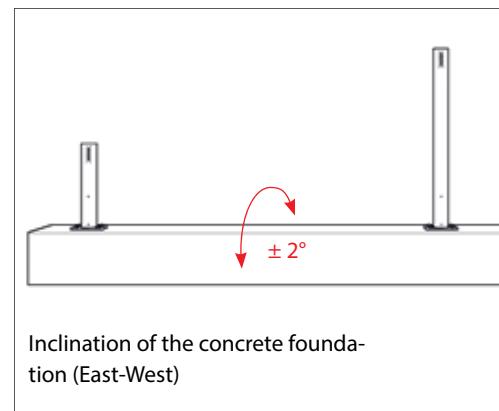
2 (east-west tilt of the concrete foundation)
